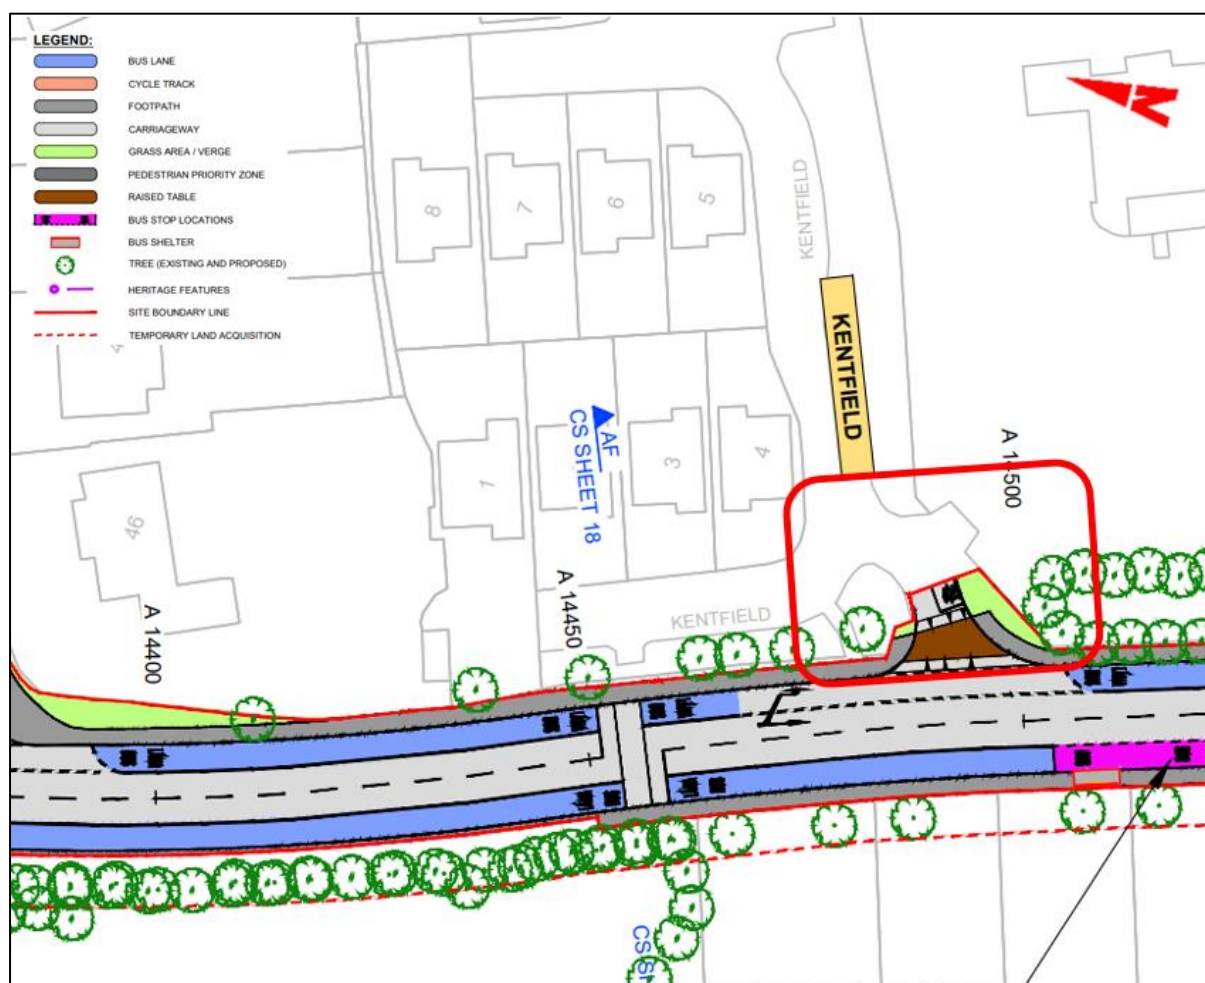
Extract from General Arrangement Drawing at Dublin Road (Sheet 41)
